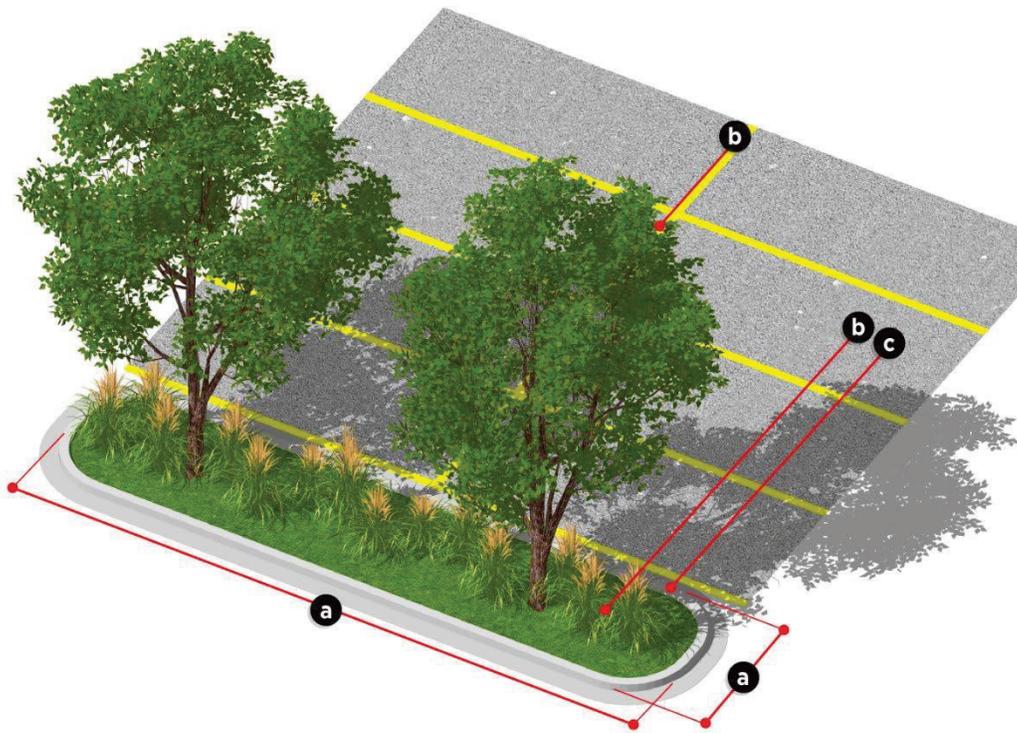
Off-Street Parking Area Interior Landscape Zone in Rear of Primary Building
